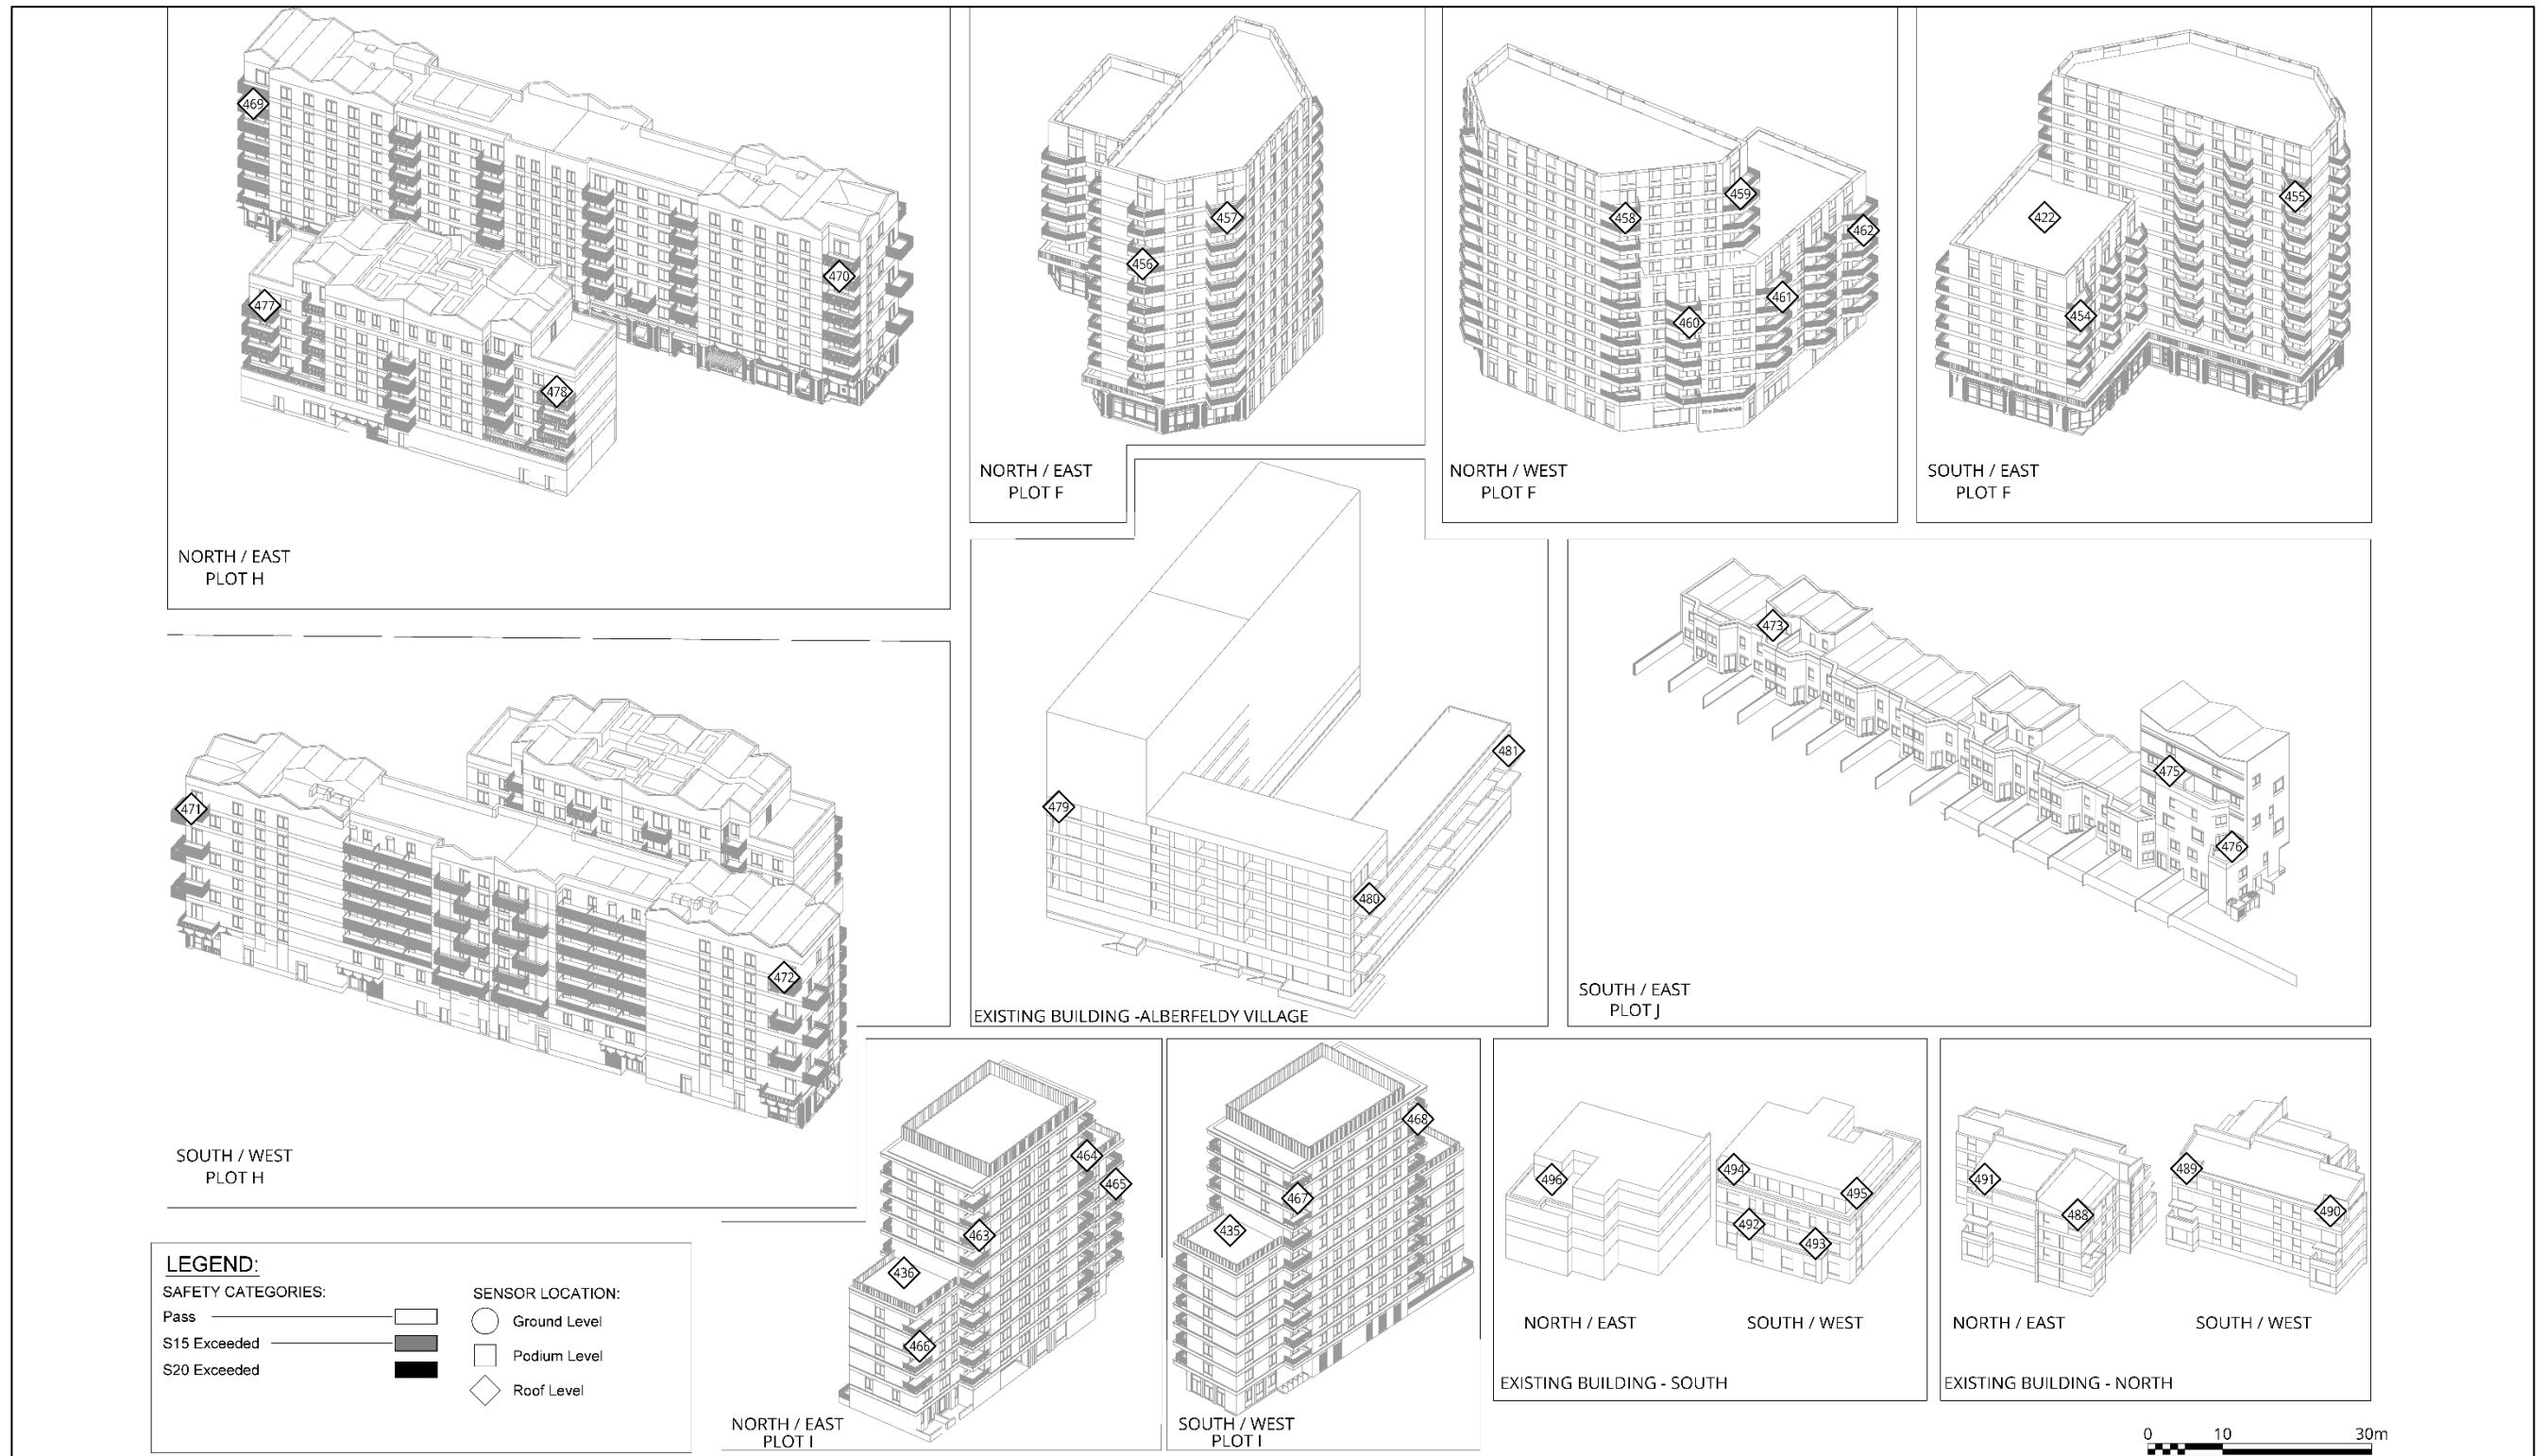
Configuration 2: Detailed Proposals (Phase A) with Existing Surrounding Buildings – Elevated Levels (Strong Winds)
